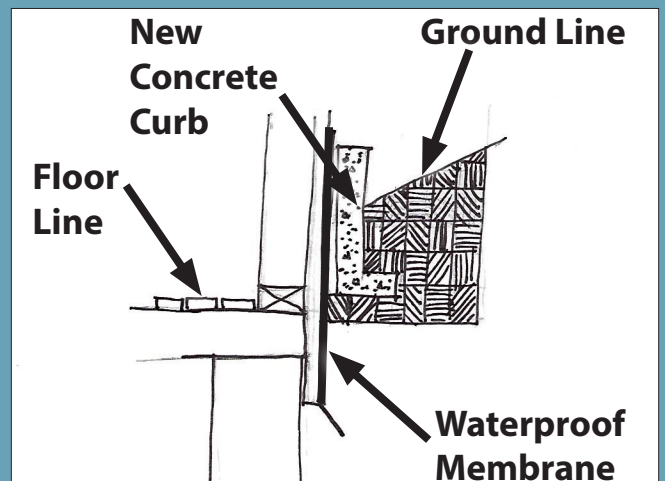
For soil above floor line add waterproof membrane and a concrete curb.
